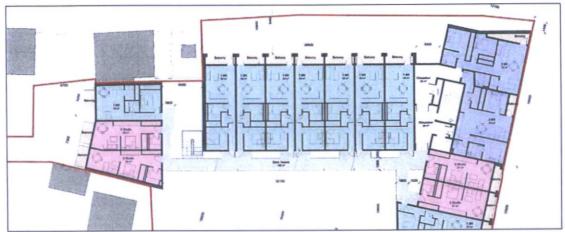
Extract from First Floor Plan Showing Pre-planning Stage 1 Scheme which Provided Balconies Accessed via the Kitchen/Living/Dining Spaces
